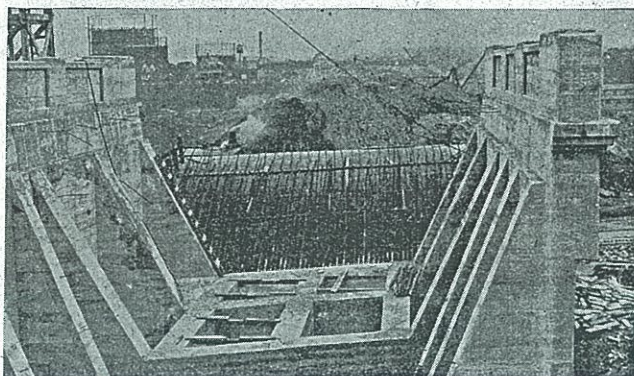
CONSTRUCTION OF ARCH BRIDGE
